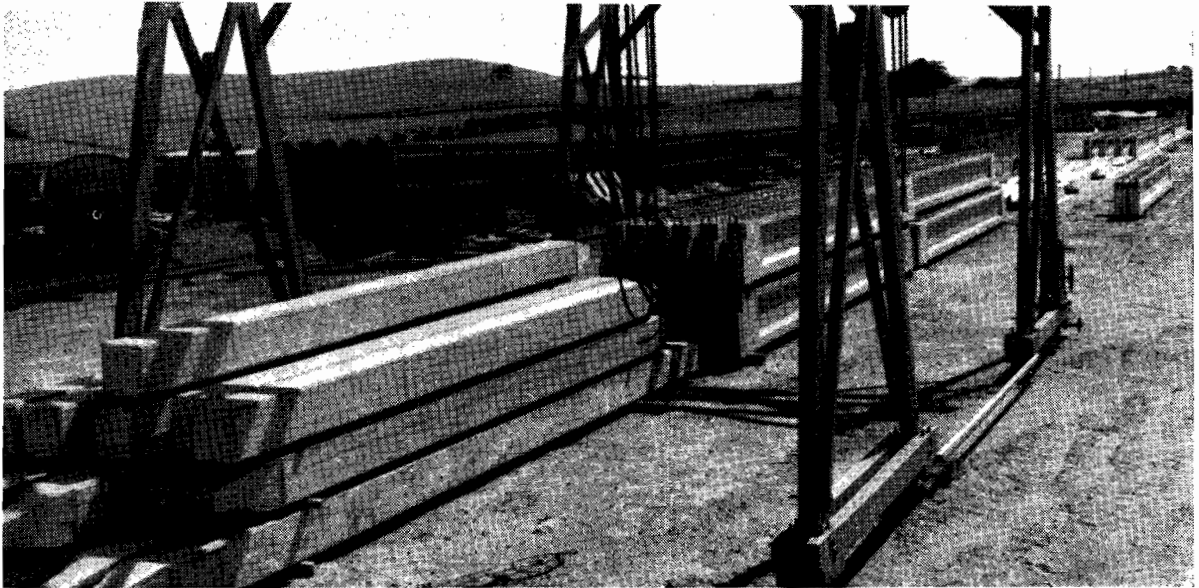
Pre-cast bridge units in Warrnambool Storeyard.
